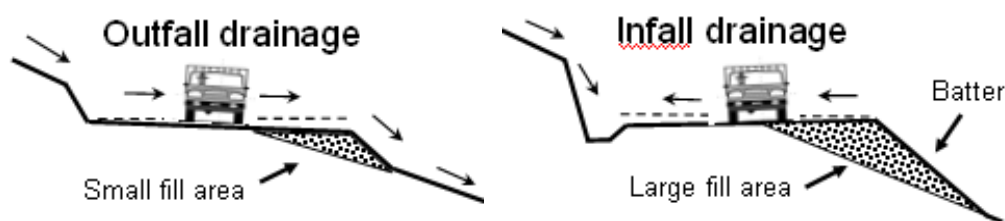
A Outfall drainage removes runoff from the road and allows for the use of lower whoa-boys.
